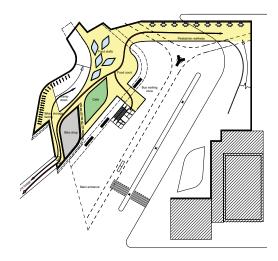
Preliminary first floor plan (NTS), suggested pedestrian bridge on the north side is inconsistent with the flow of plan.
